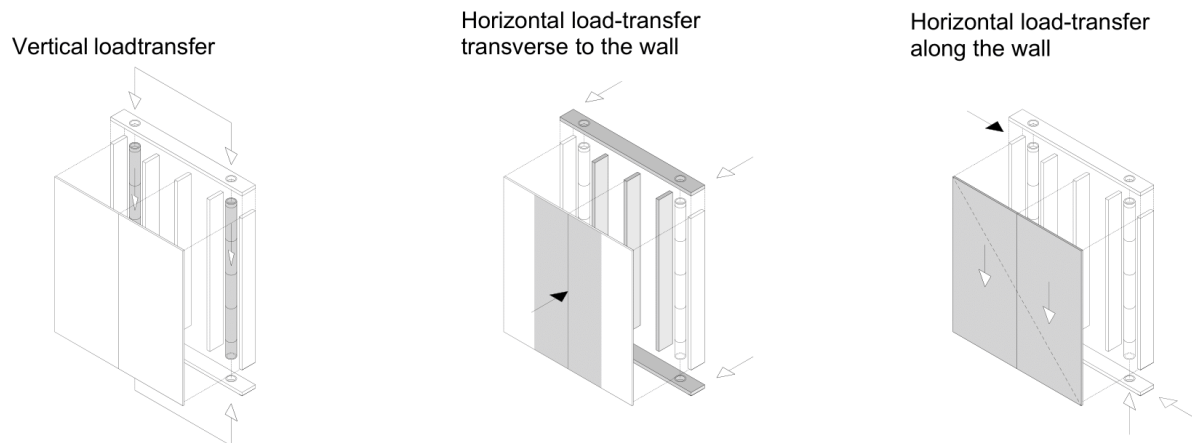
Vertical and horizontal load-transfer in a hybrid panel construction wall
